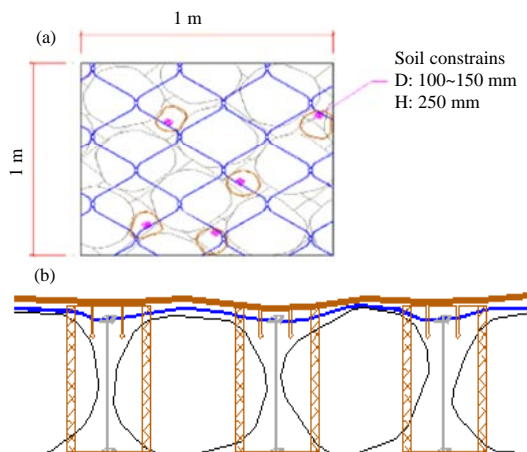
Specification of soil constraint filter: a) Plane figure and b) Cross section
